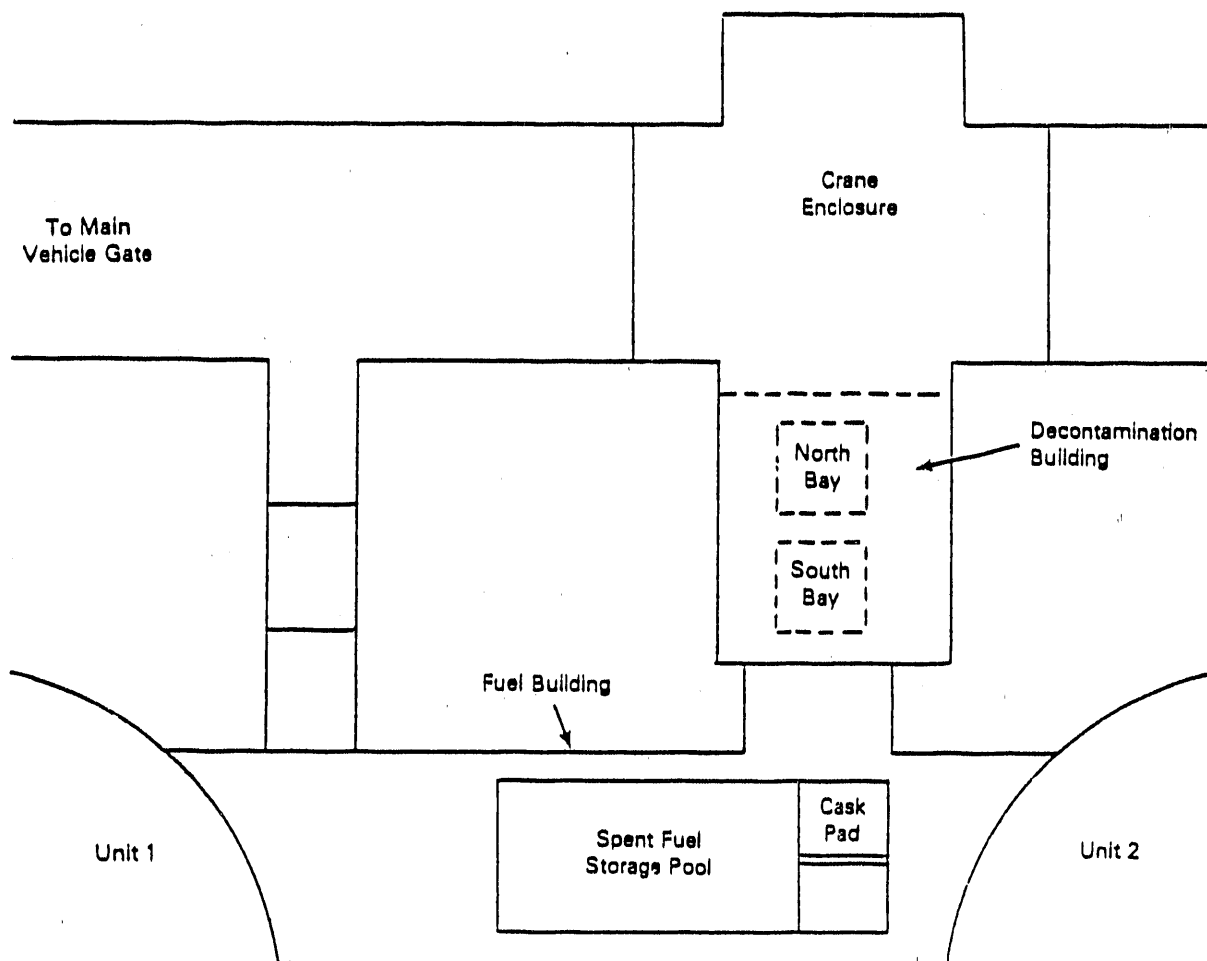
Surry Power Station Cask Handling Facilities
